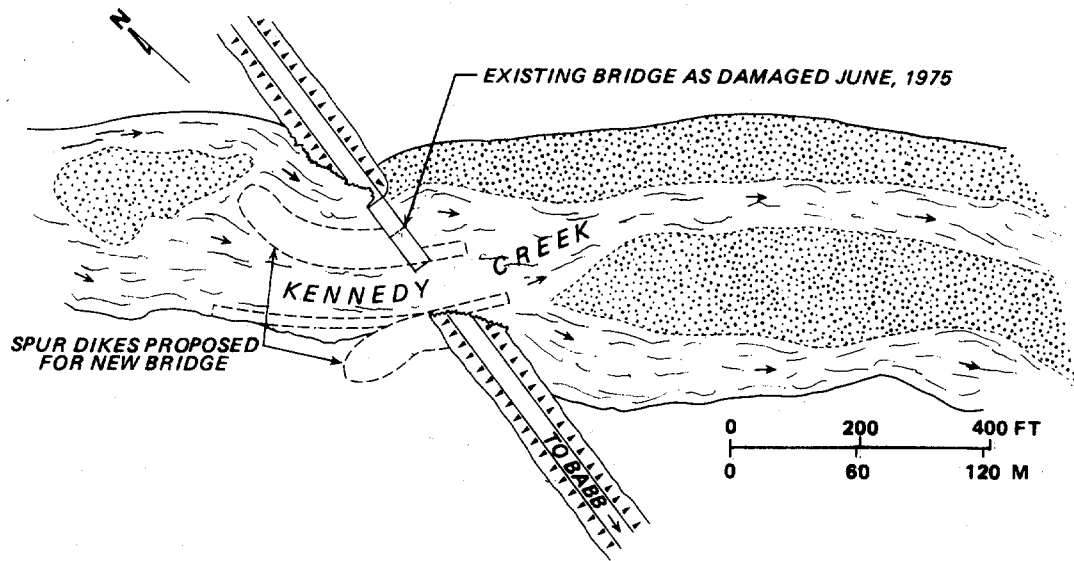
Plan sketch showing 1975 flood damage at US-89 crossing site. Also shown, in dashed lines, are spur dikes proposed for new bridge.
